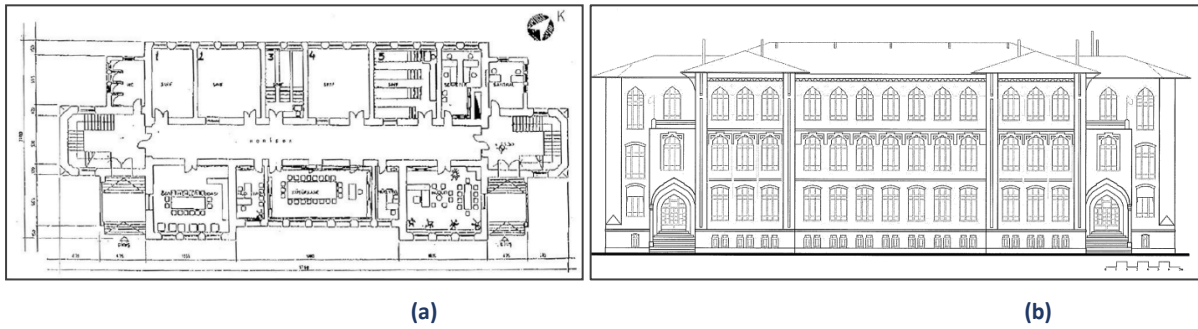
a) Male Teacher High School ground floor plan b) Male Teacher High School entrance facade (Sözen, 1984)
